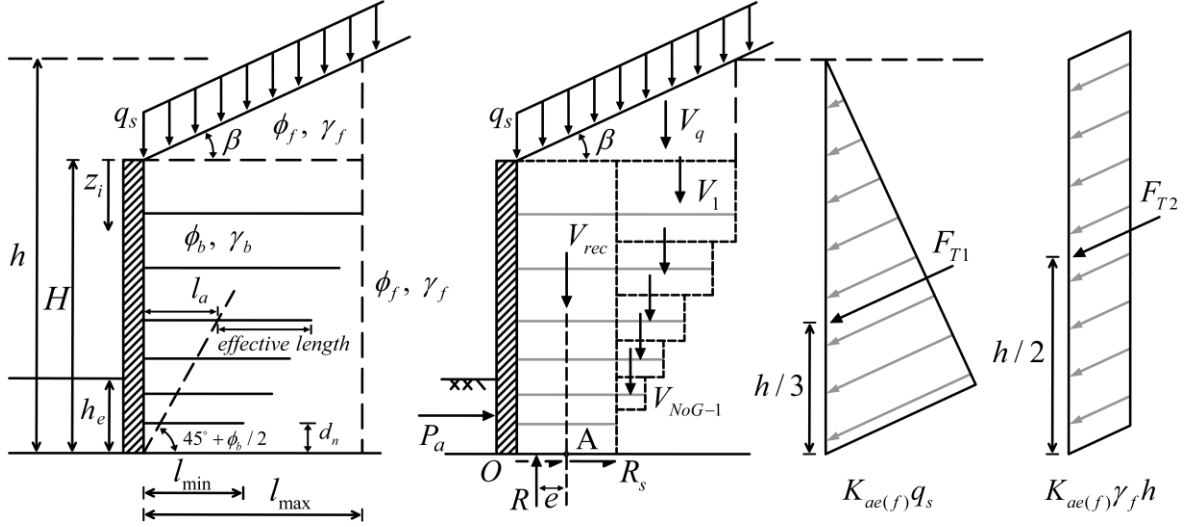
Parameters used in different steps of the design and external forces considered for the Geosynthetic reinforced retaining wall system.
